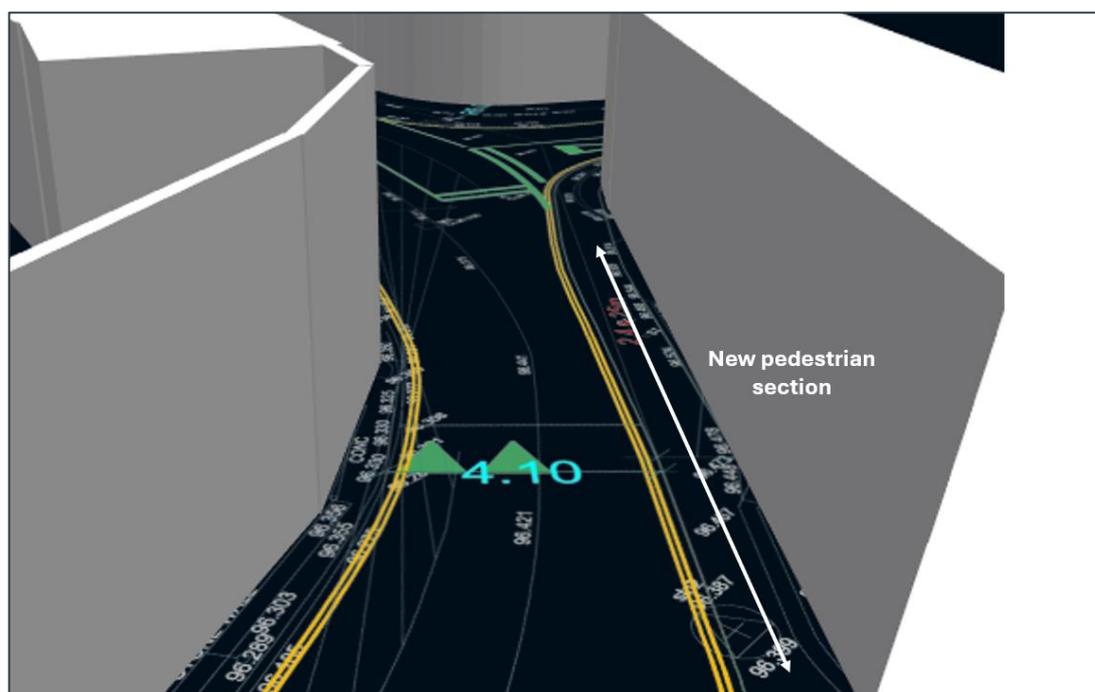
PROPOSED 1.2 METRE FOOTWAY SECTION
